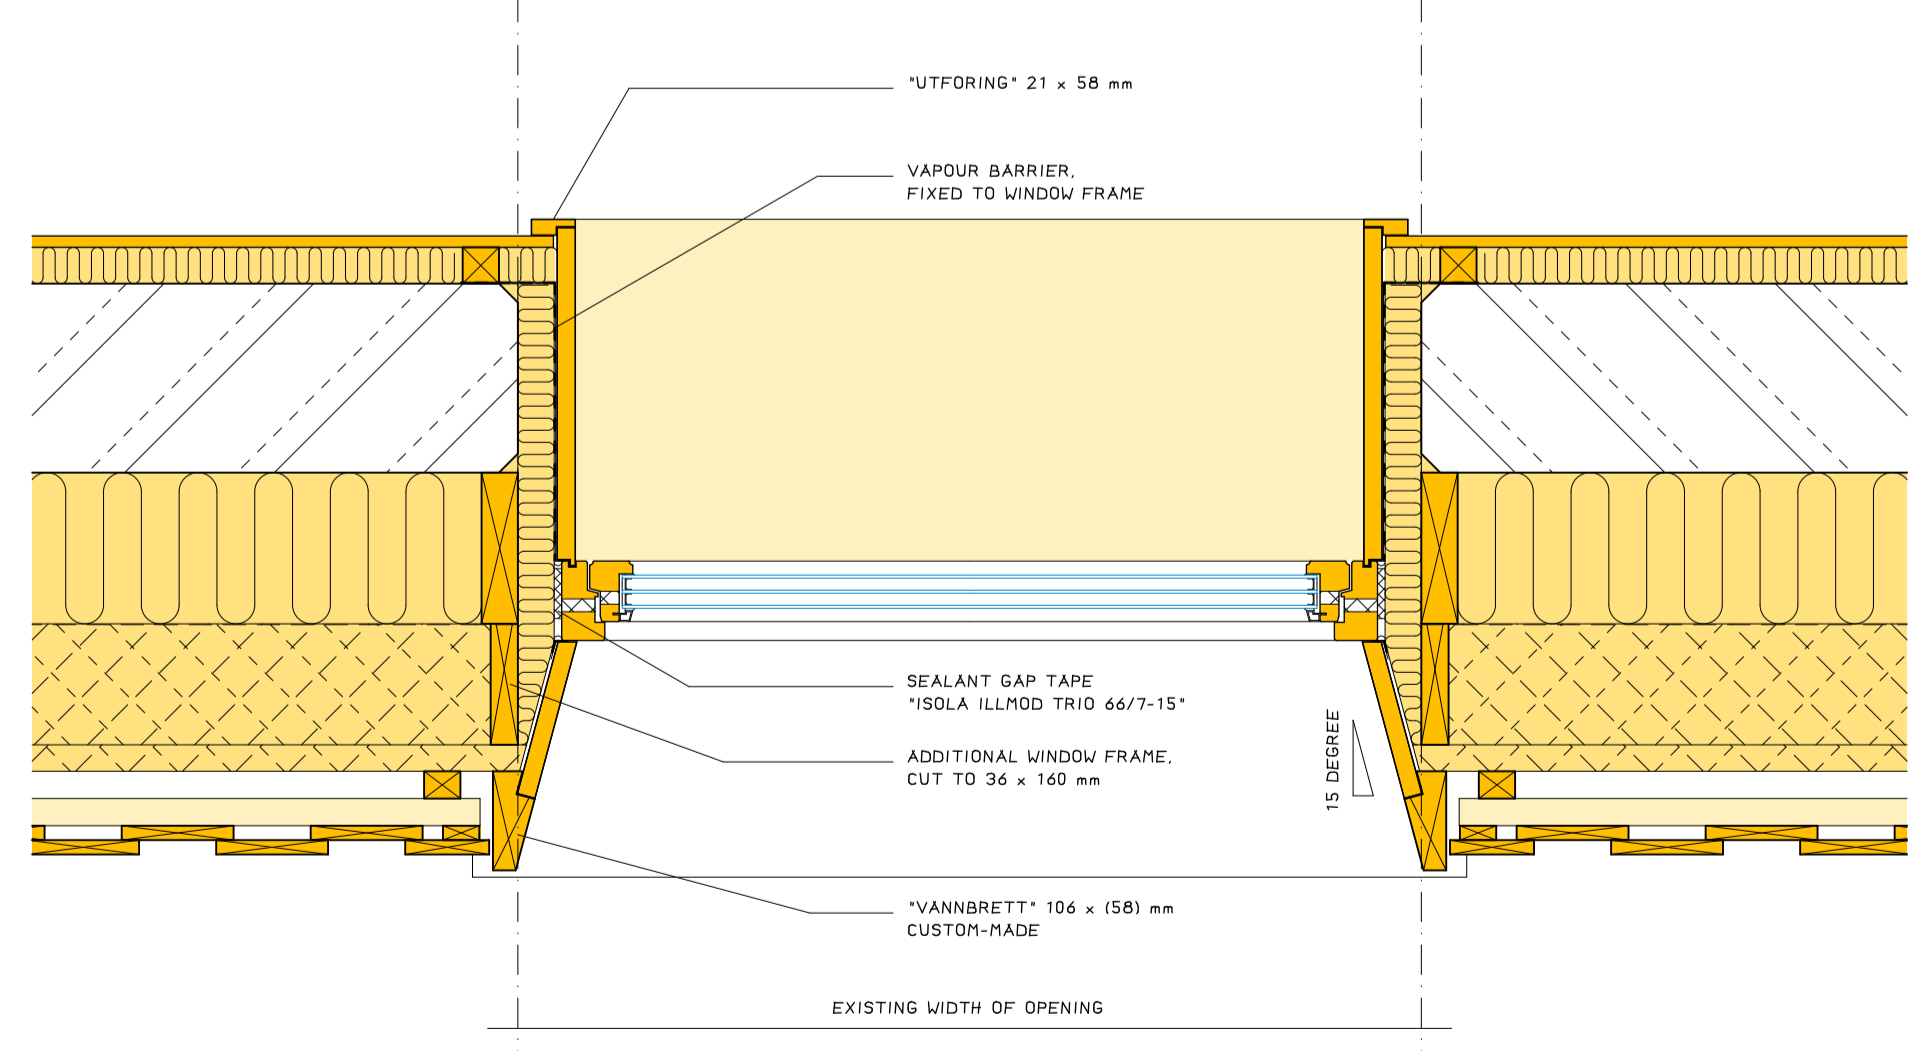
DETAIL WINDOW SILL FIRST FLOOR 1 : 5
